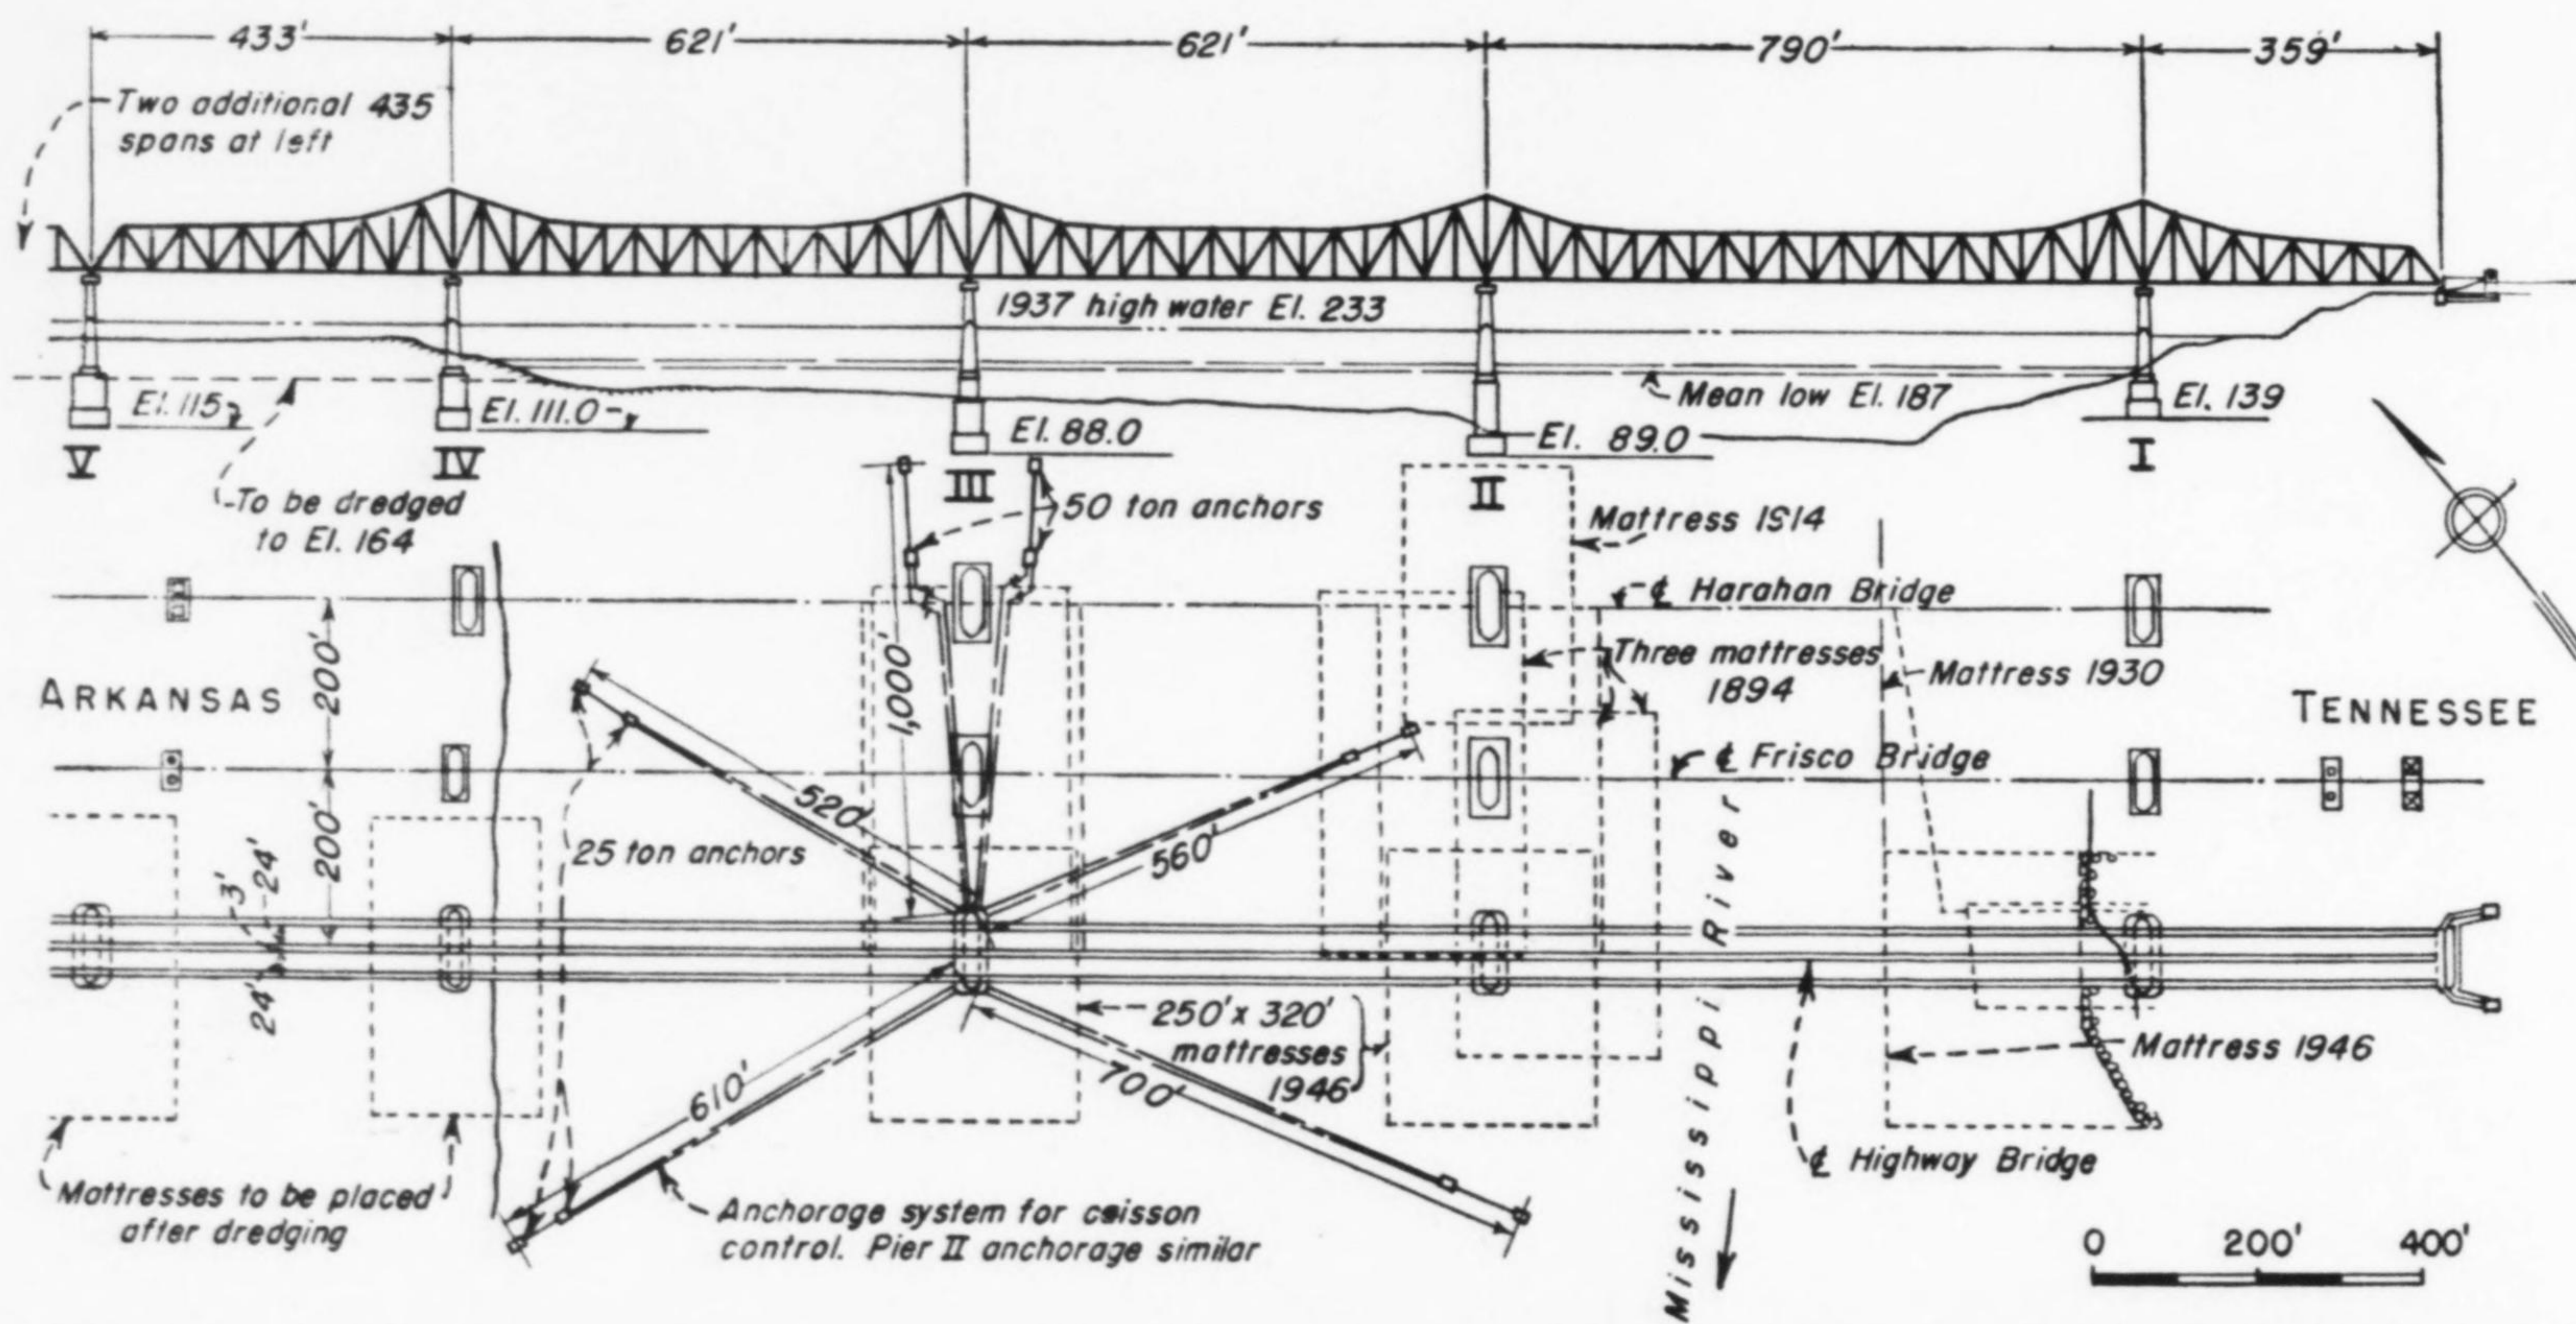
Elevation and site layout for new Memphis bridge. Piers are founded on firm clay foundation after being sunk through sandy silt and clay. Mattresses are used around the piers to prevent wash. Some of the protection mats from the 1893 work were encountered but those at Pier II of the earlier bridges, where the channel has been cut deeply by water action, were not found.
